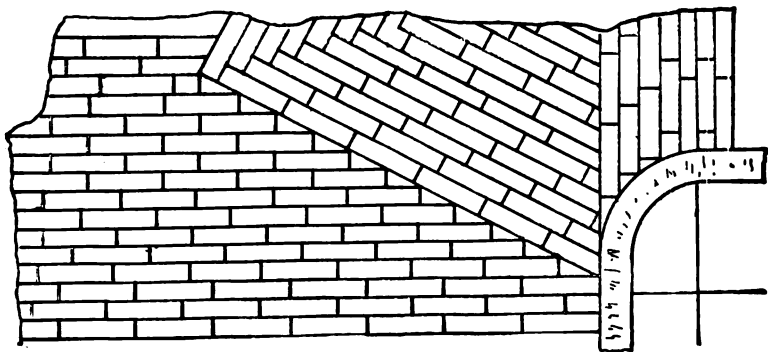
PLAN SHOWING ARRANGEMENT OF JUNCTION.
